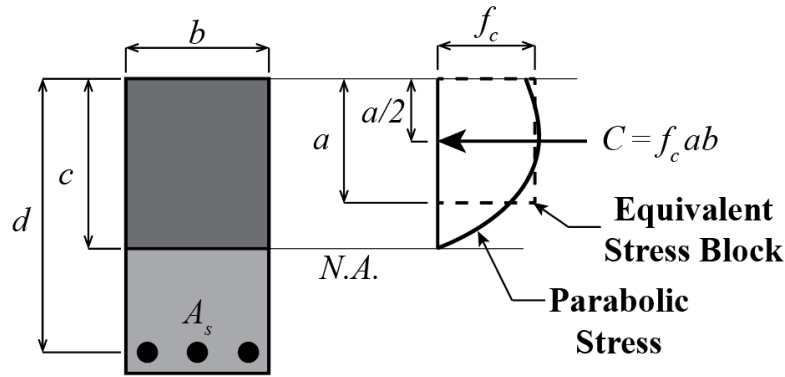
Beam Equivalent Stress Block recreated from Whitney (1937)
